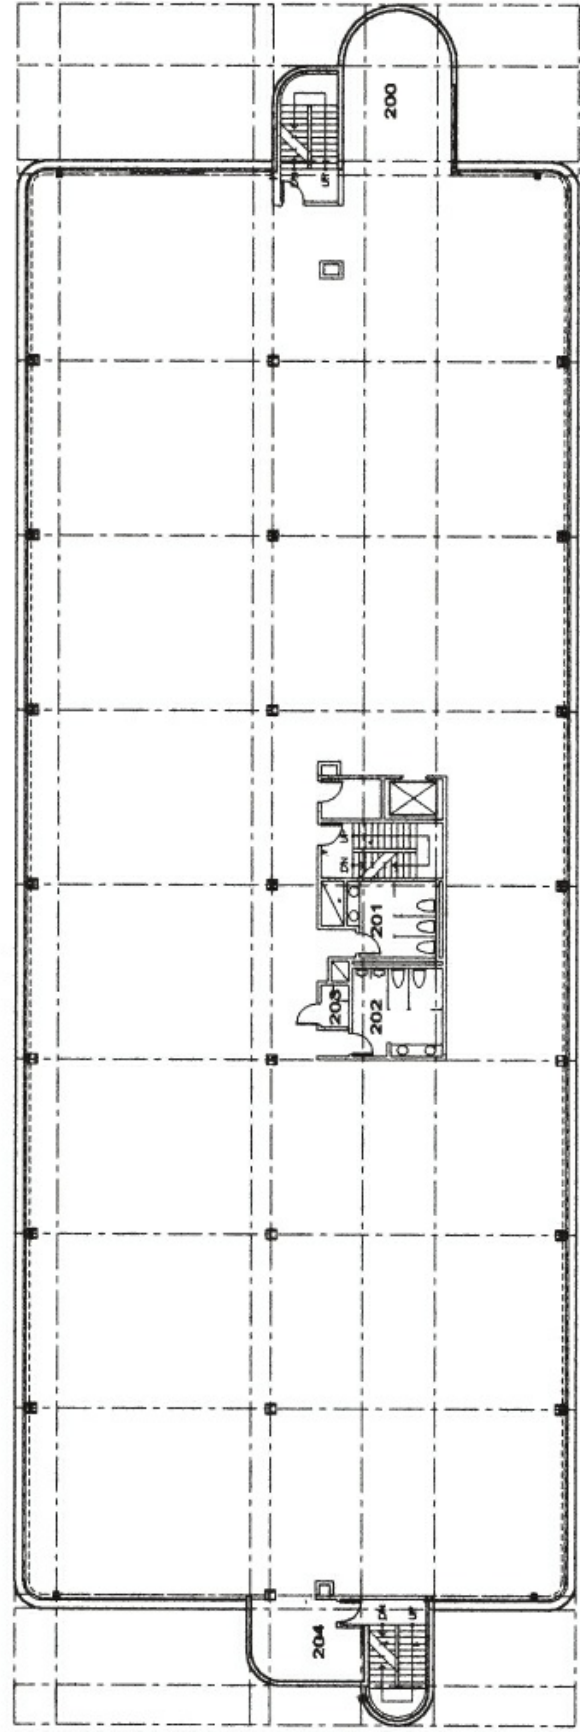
(#) Madison Building—Stage II: Working drawing—second...floor plan.
